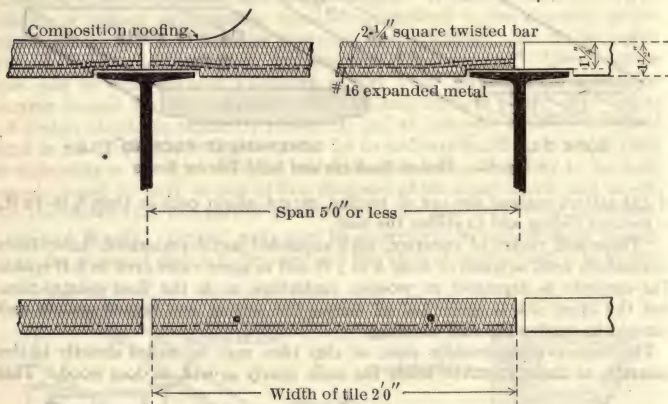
Bonanza Reinforced-cement Tiles for Flat Roofs
